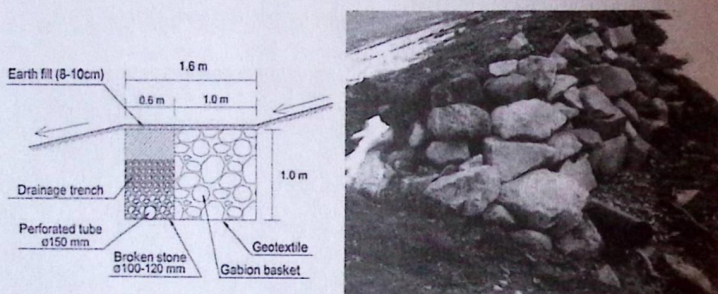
Stabilization and drainage construction (outflow; Stara planina, October 2008)
